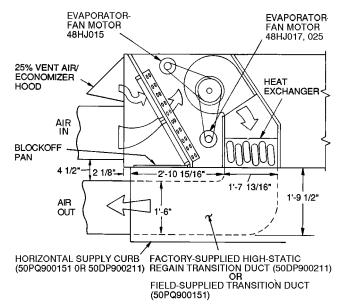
Horizontal Supply/Return Curb and Horizontal Adapter Details
